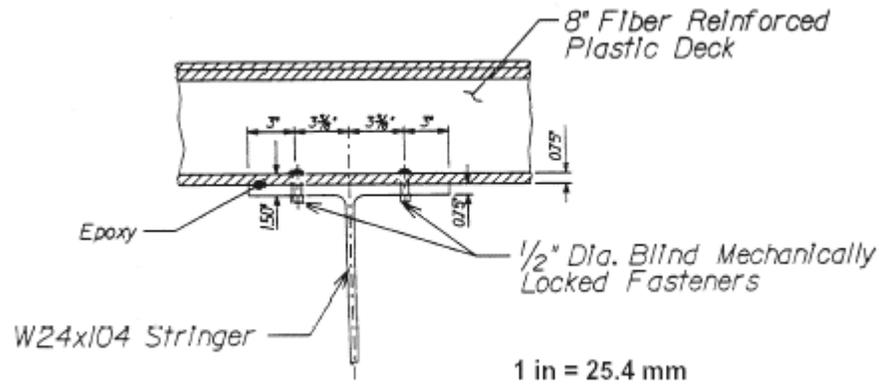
Deck to stringer connection using BOM blind bolts. [Source: Shekar et al. (34).]
